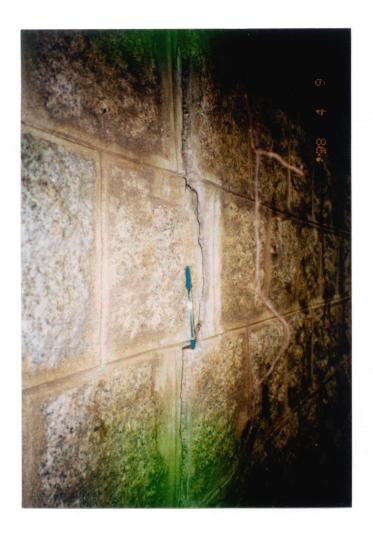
Crack in the Retaining Wall about 15 m Southeast of the Landslide (Photograph Taken on 9 April 1998)
